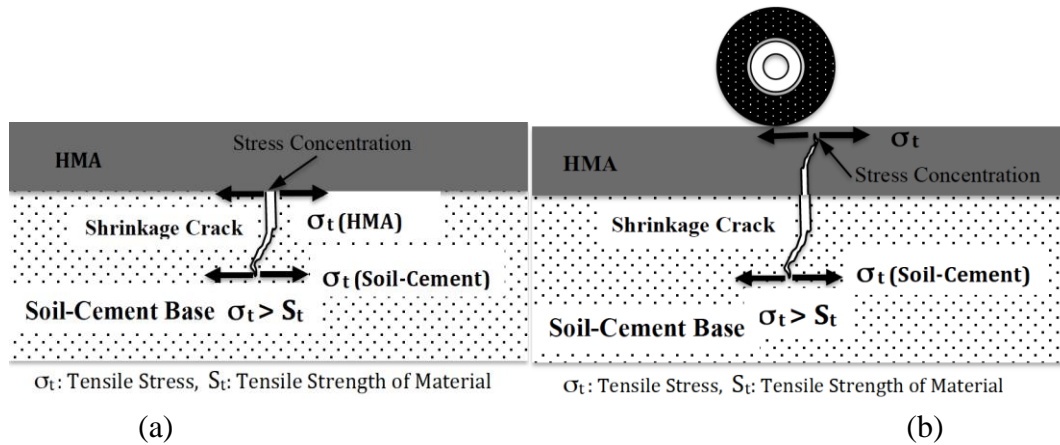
Mechanism of reflective crack development in flexible pavement with soil-cement base (a) stress concentration at bottom of HMA, (b) crack propagation and stress concentration in HMA [13]
